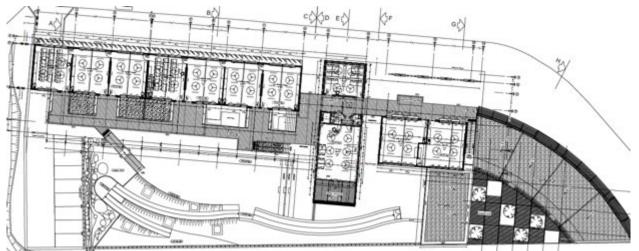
Floor plan of the second floor of the school. © Antoine Perrau Architecture.
